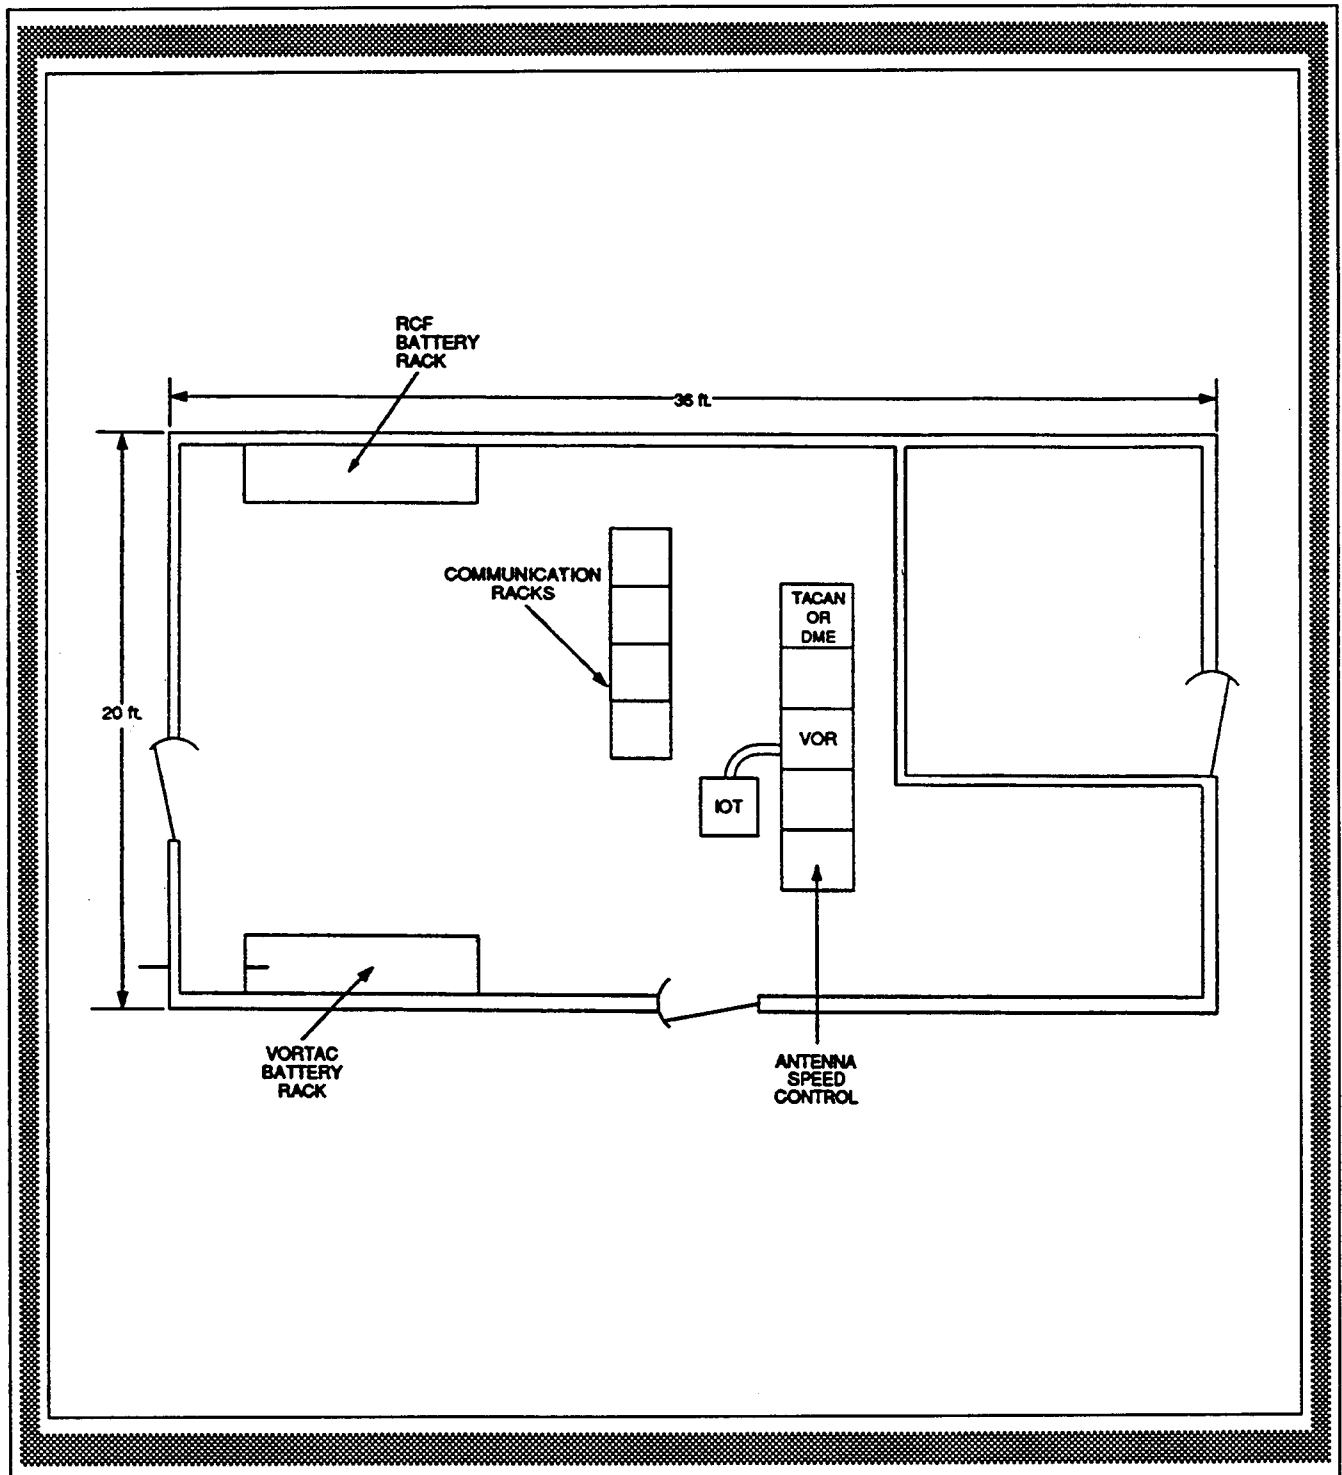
RCF/VORTAC COLLOCATED IN A 20'x 36' BUILDING
